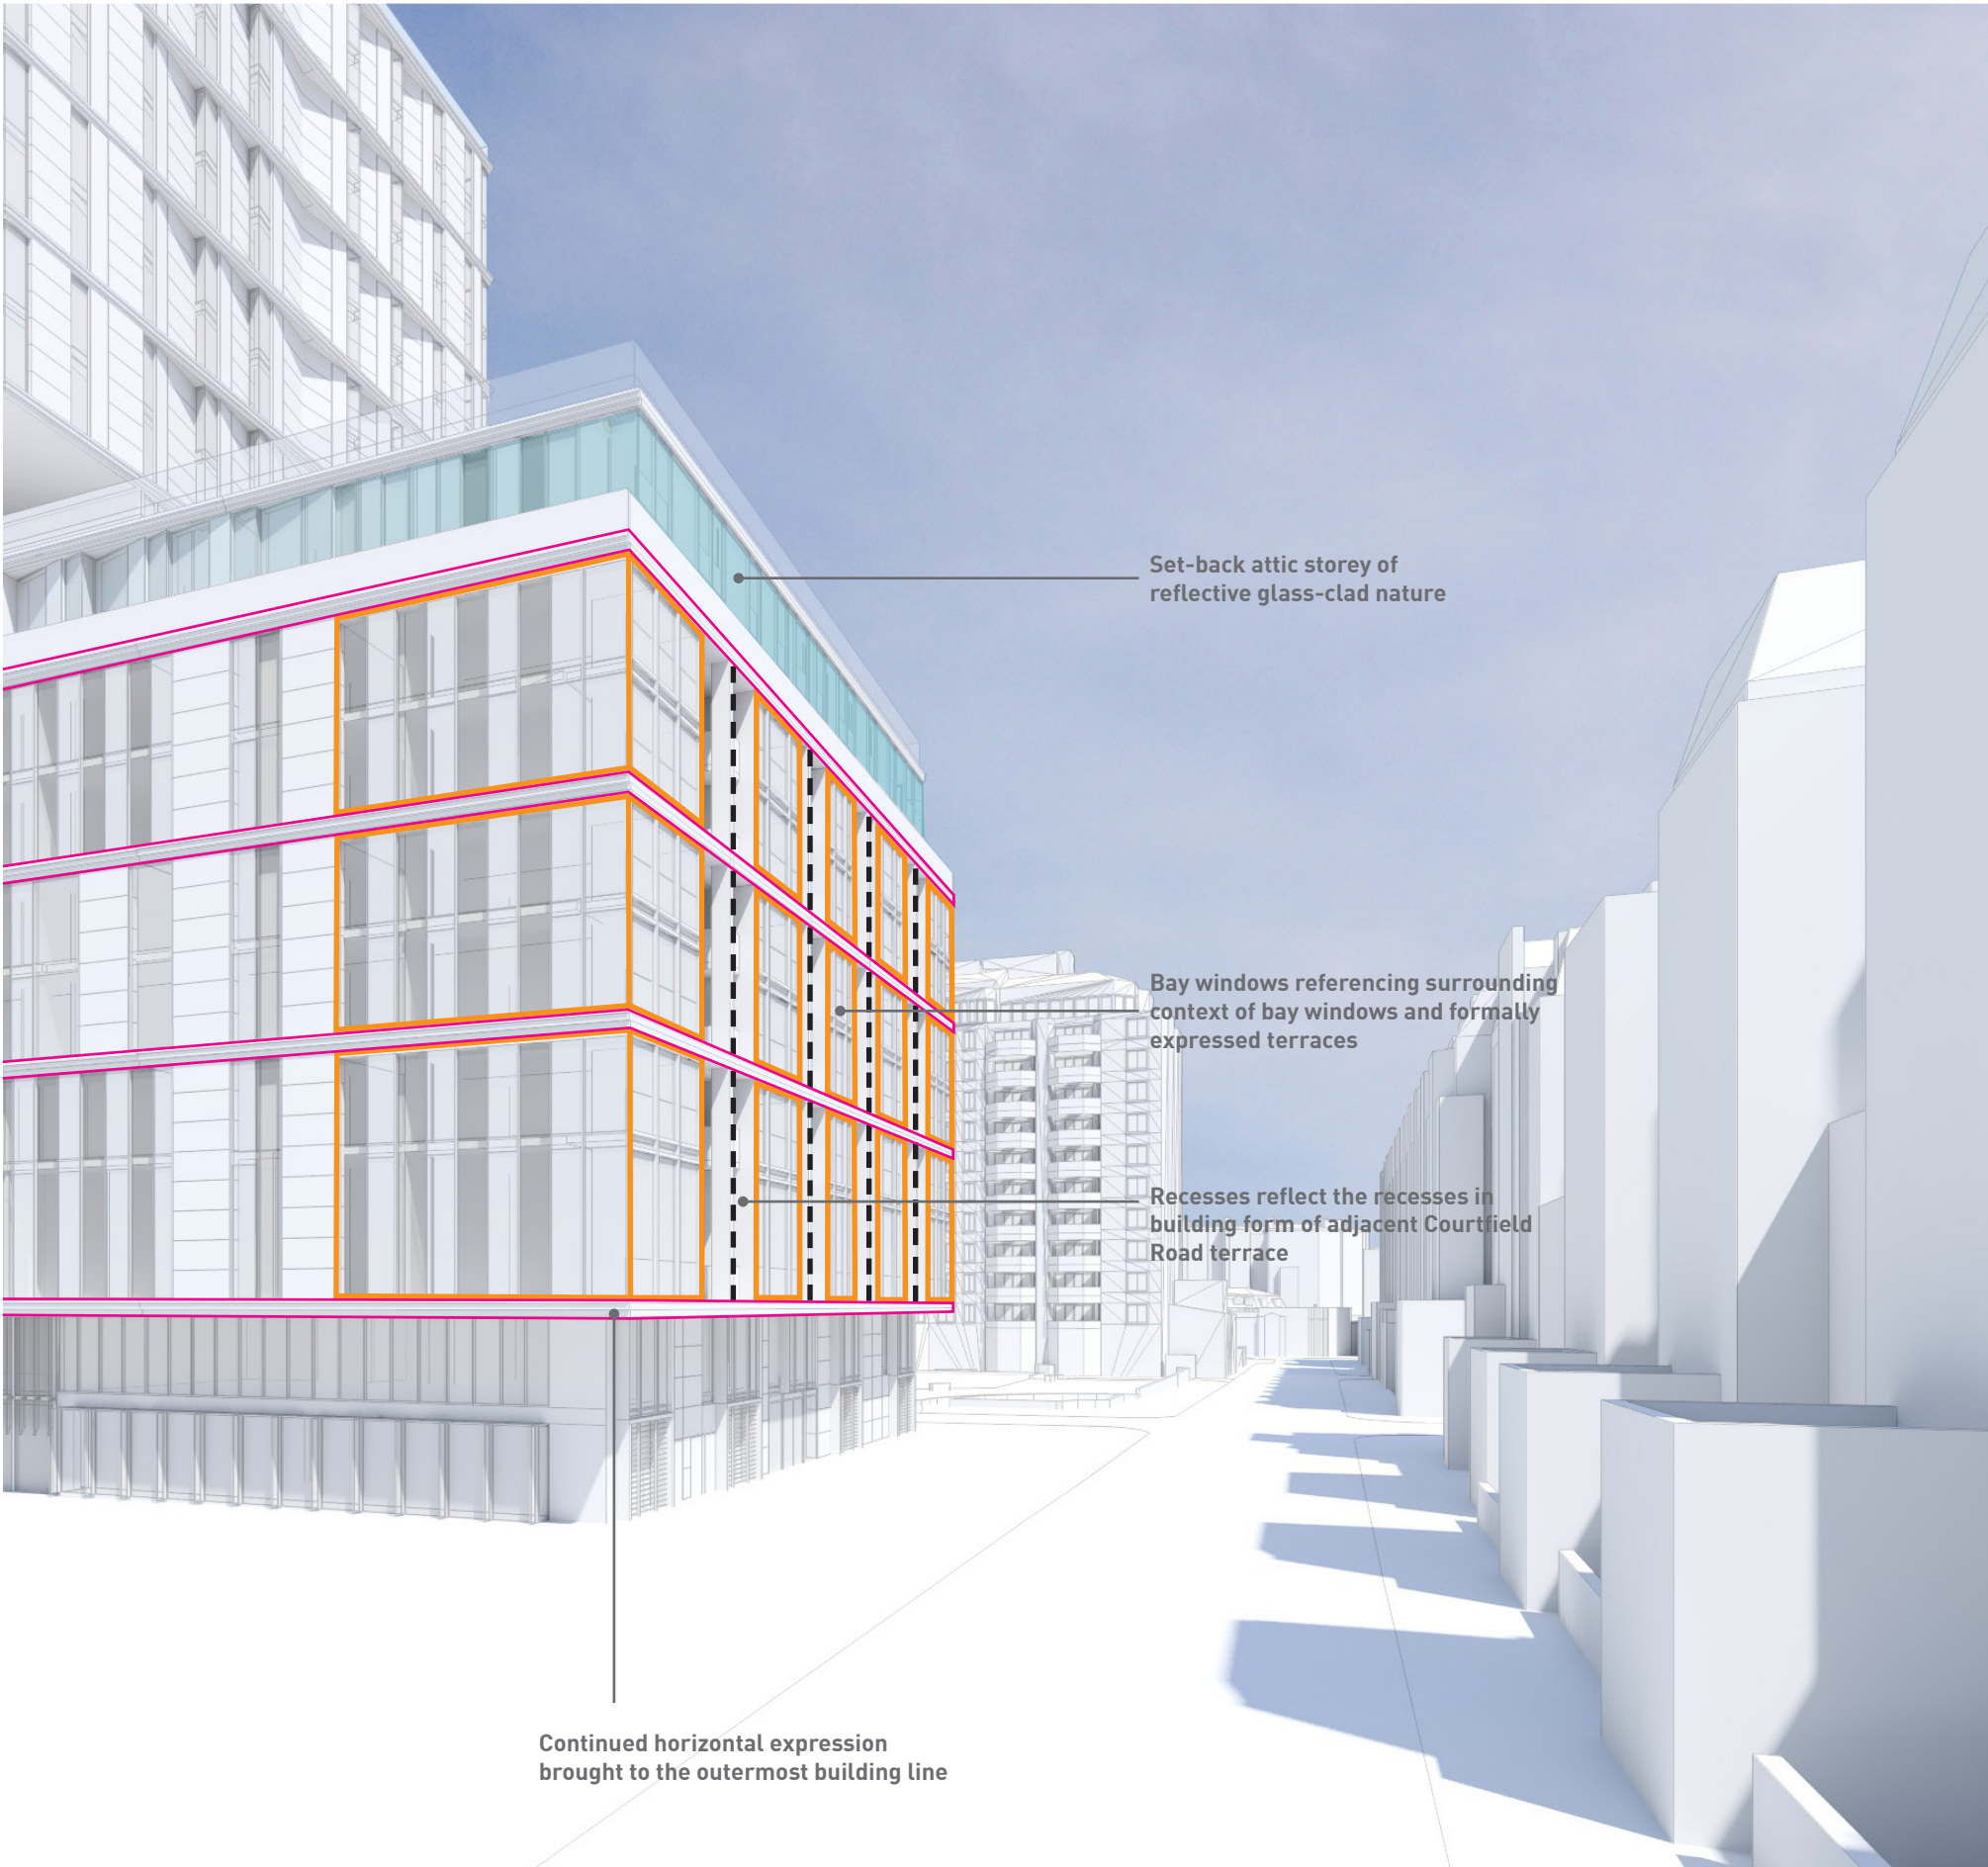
Concept diagram explaining the key elements of the amended facade strategy for the Courtfield Road elevation
